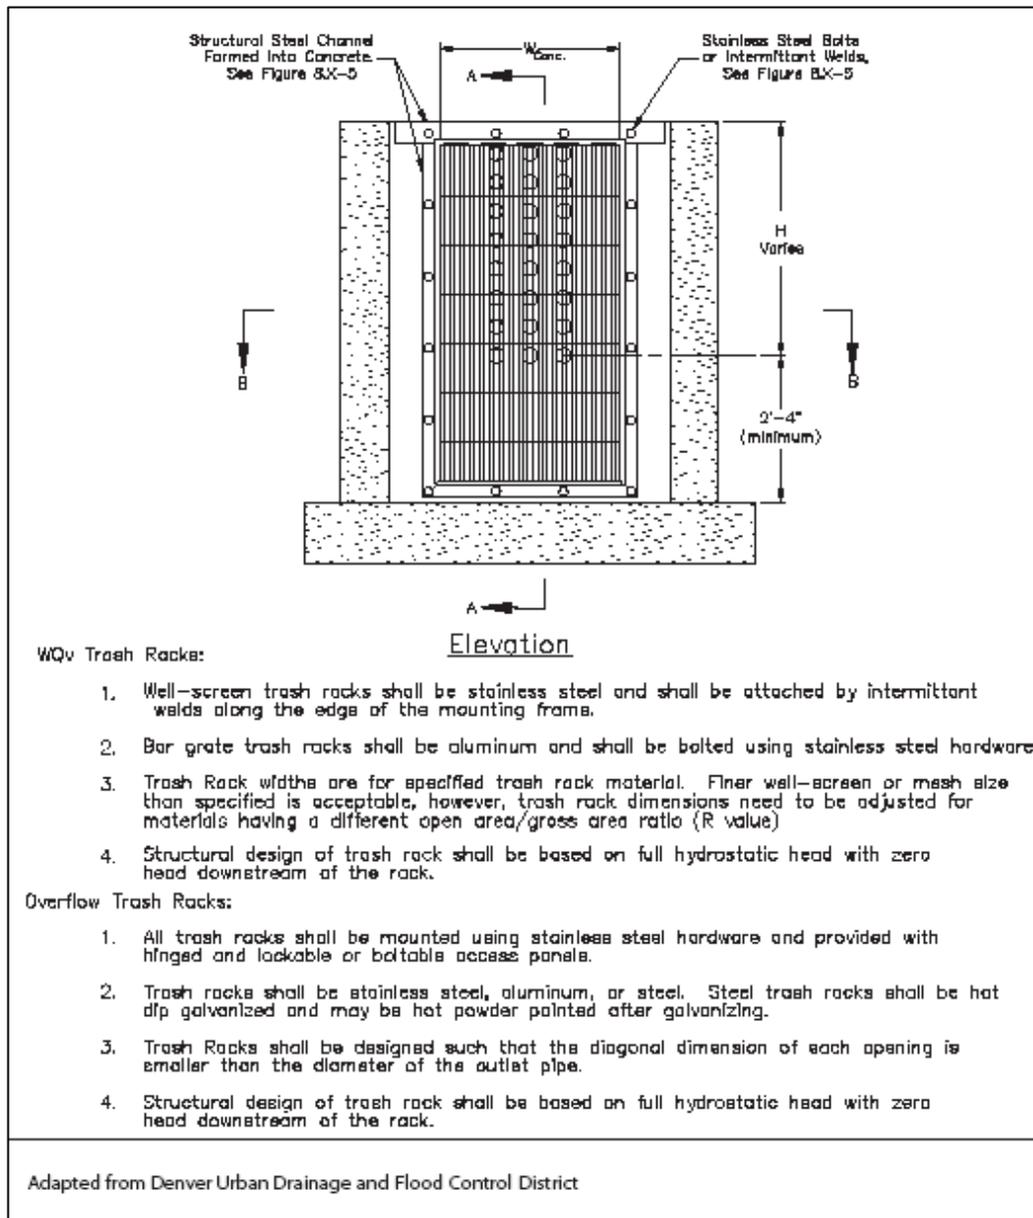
WQv Outlet Trash Rack Design (2)
